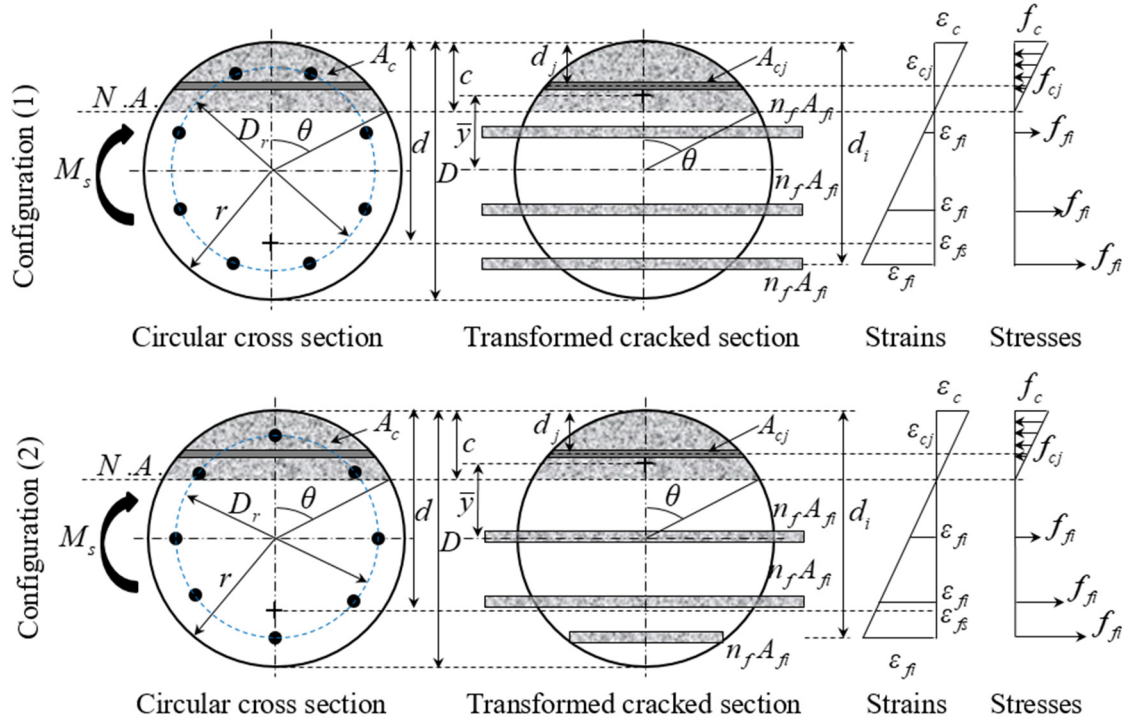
Transformed cracked section, strains, and stresses at service load condition.
